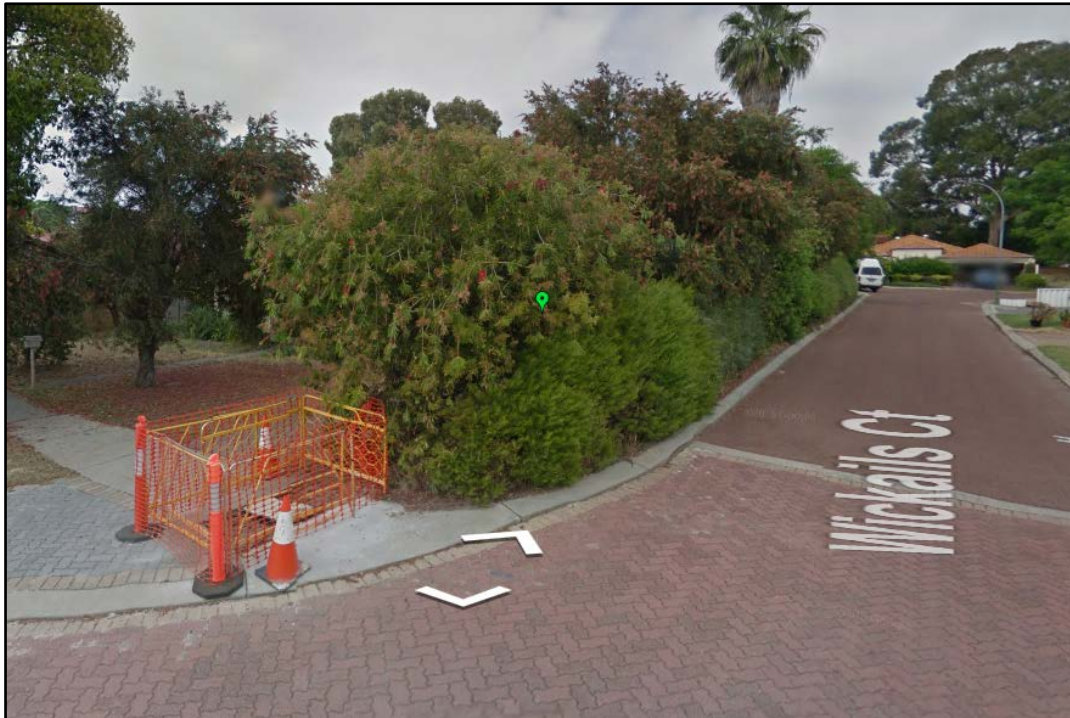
Existing site as viewed from the corner of Gladstone Road and Wickalls Court (Source: Nearmaps)
